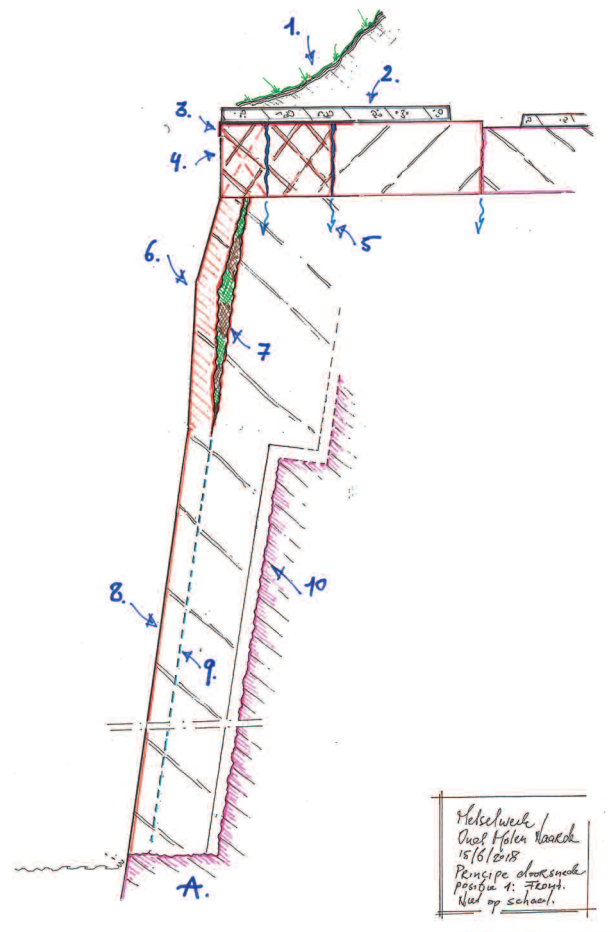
schematic cross-section of the wall, showing the various types of damage, noted during the detailed inspections.
